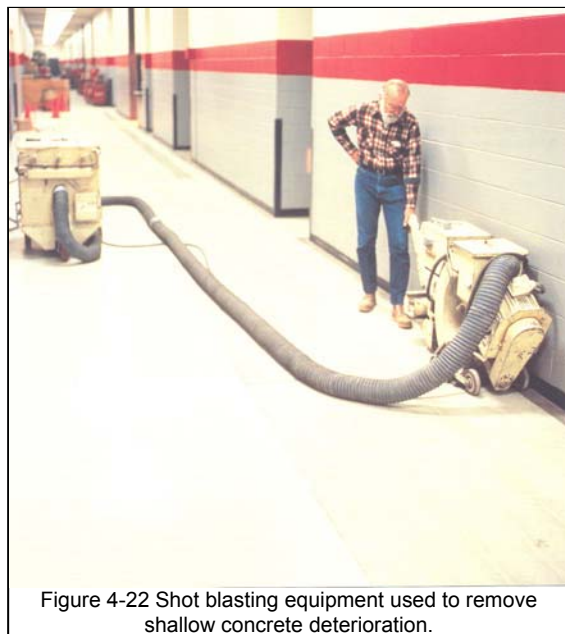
Shot blasting equipment used to remove shallow concrete deterioration.
